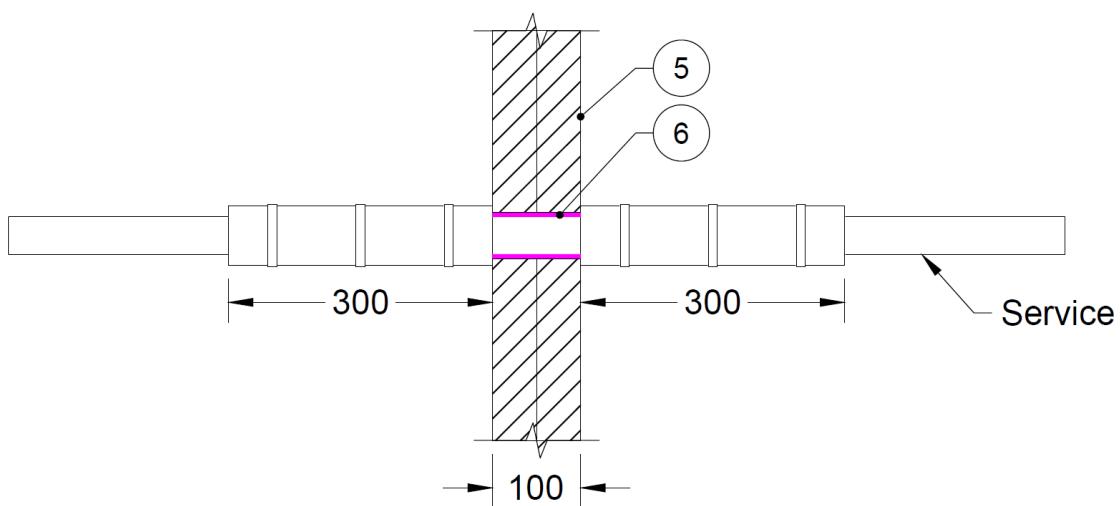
Section View of Pipe conduit with cables Installed in Vertical Substrates
